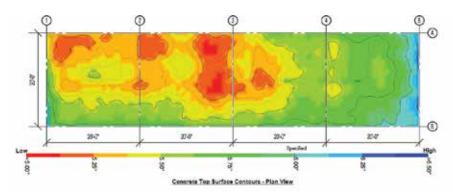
Plan view with contour intervals for concrete top surface elevations
